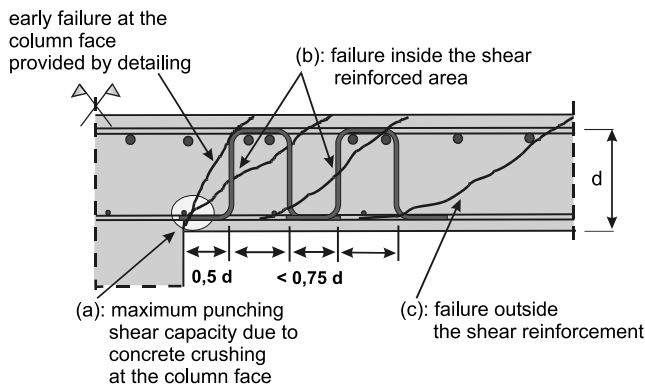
Possible failure modes of shear reinforced flat slabs.
